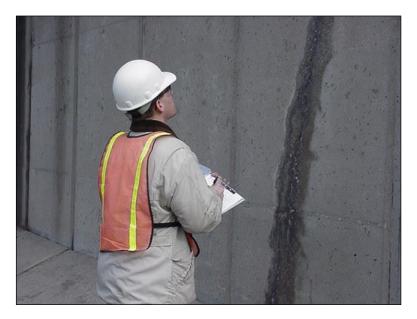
Inspector Conducting Visual Inspection.
